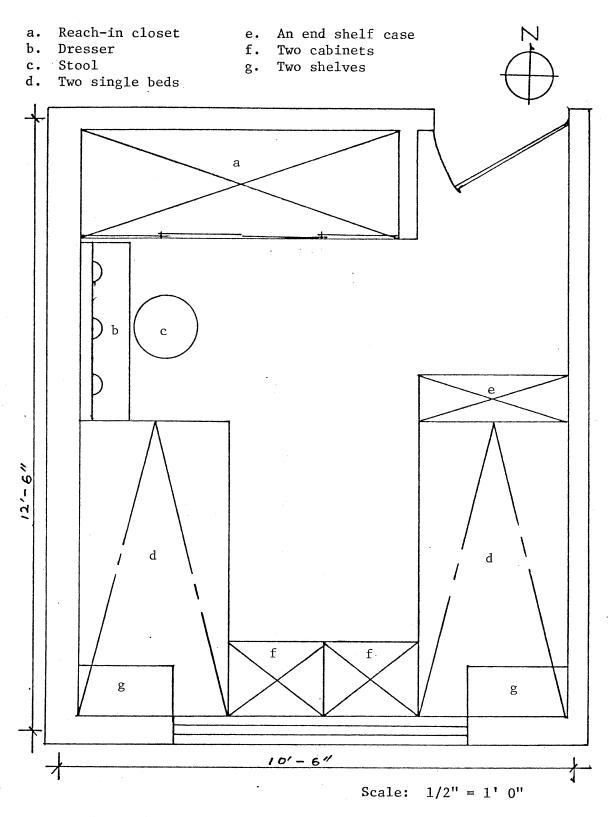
The Floor Plan for Room One of Solution ${\tt B}$
